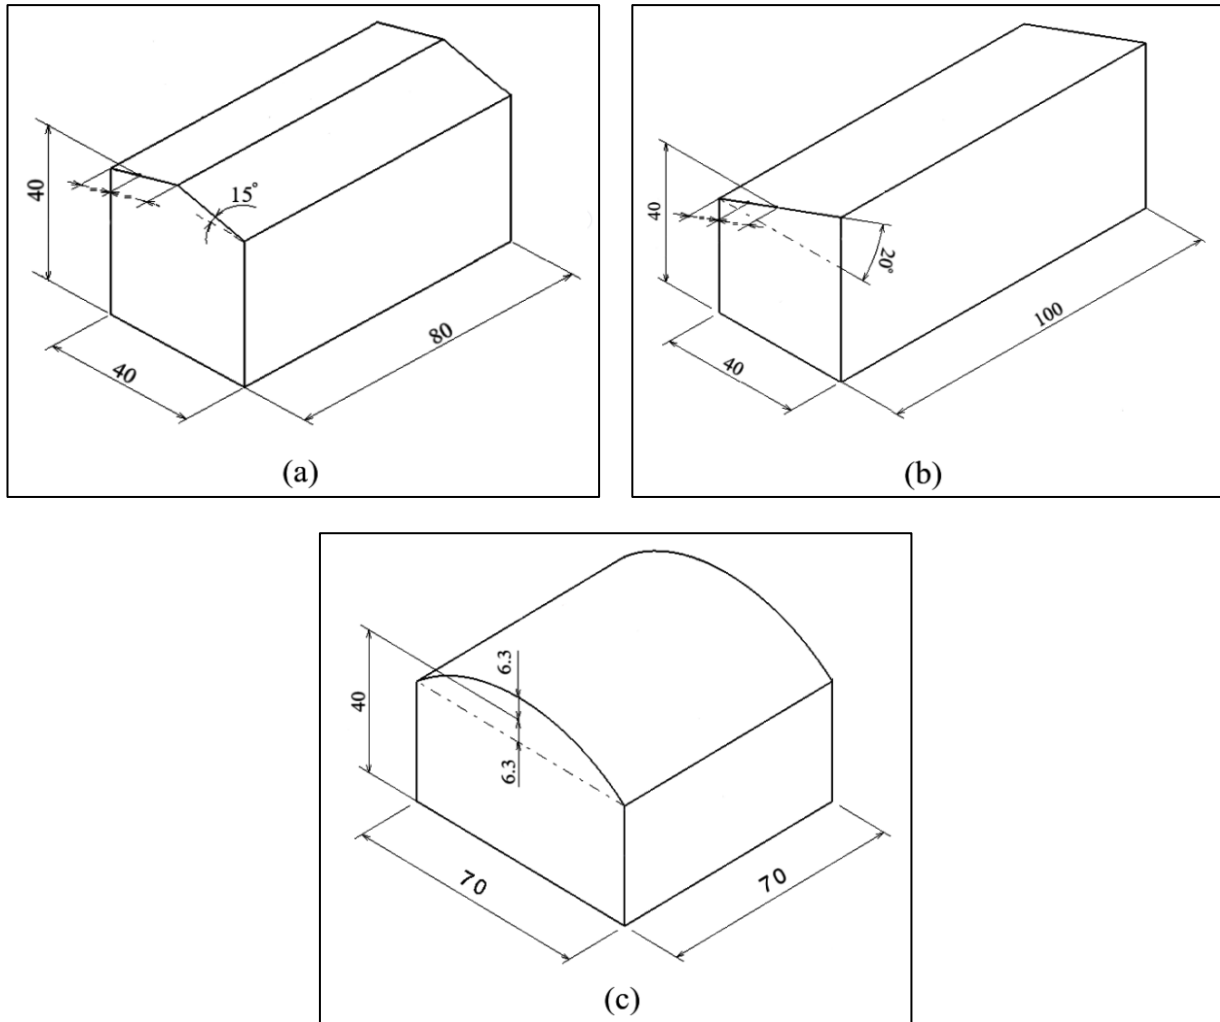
(a) The model of the gabled roof building, (b) The model of the mono-sloped roof building, (c) The model of the curved roof building, dimensions in mm
